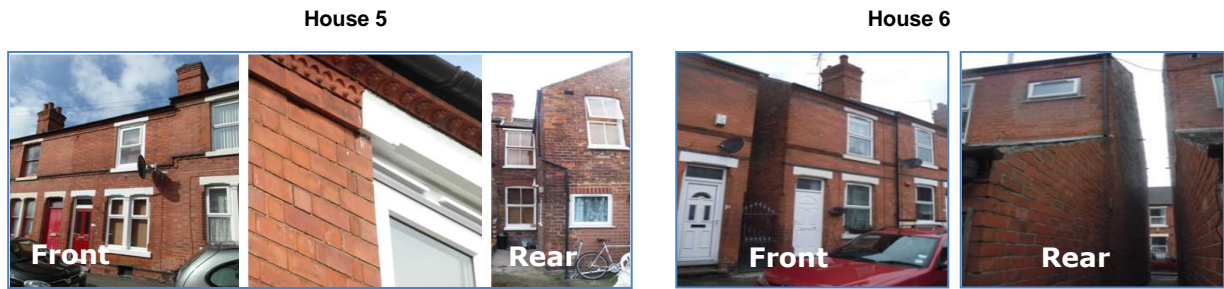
Front and rear architectural façade details of the Bilsthorpe houses (5-6)
